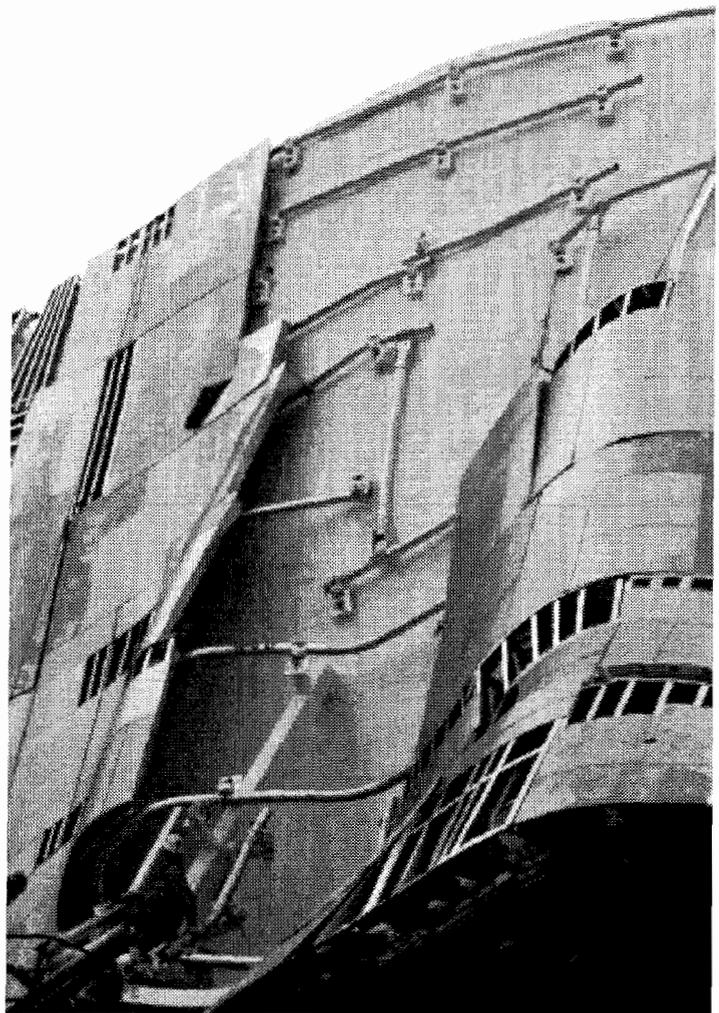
EMP cladding under construction – steel pipe support structure over shot-crete (photo by Eric Olson)
